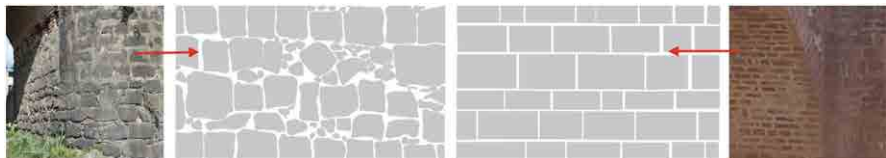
Left, masonry stone system of Los Esclavos Bridge. Source (Author 2018) Right, Masonry stone system of Las Donadas Bridge. Source (Garcia 2008)
